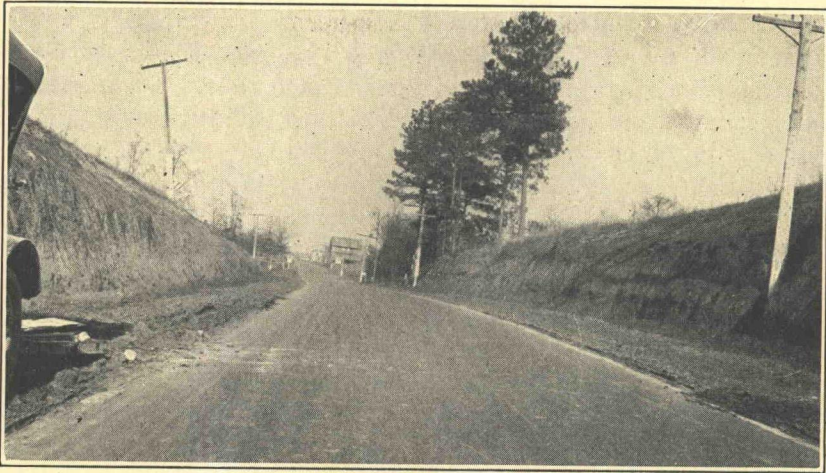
Saturated Strata in a Costal Plain Cut. Subgrade treated and drained. No Pavement Failure
